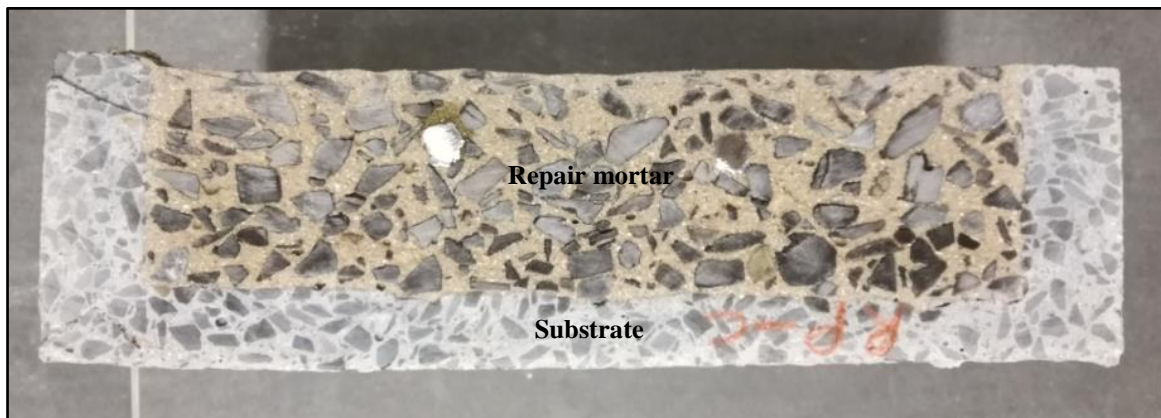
Cross-section of polymer-cement concrete patch repair
